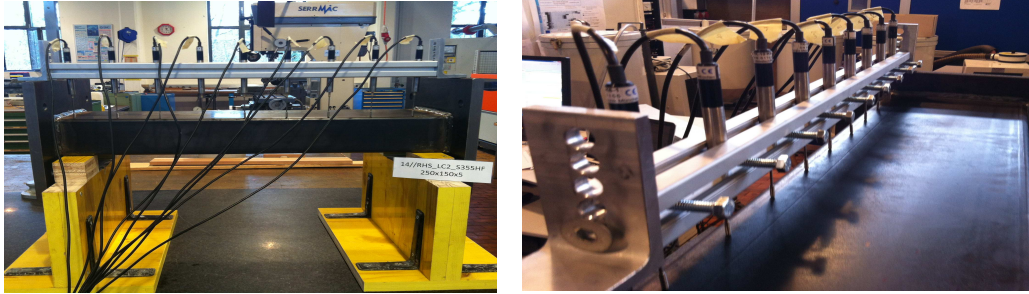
Geometrical imperfections measurement – LVDTs detail bar
